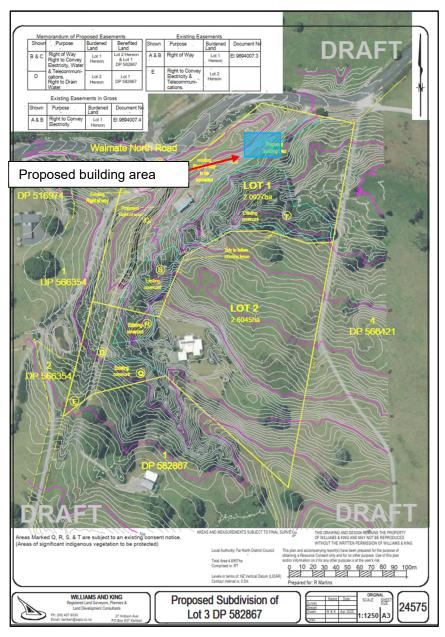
Proposed subdivision plan (Williams and King Ltd).
